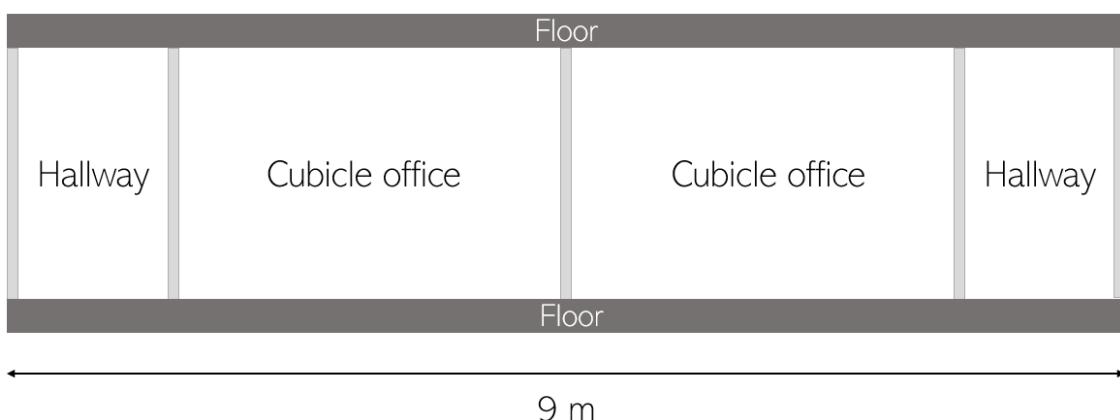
Example of cross section floor with cubicles and less busy hallways
